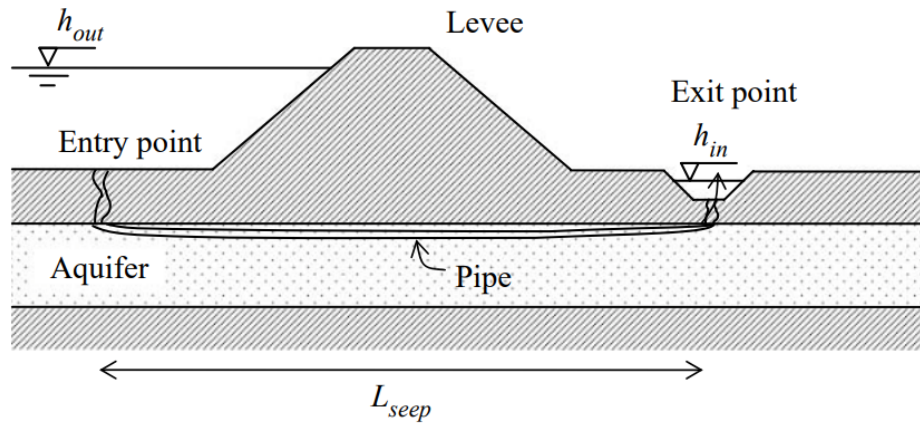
The piping failure mechanism: levee cross-section and relevant geometry parameters (Jongejan and Calle, 2013).
